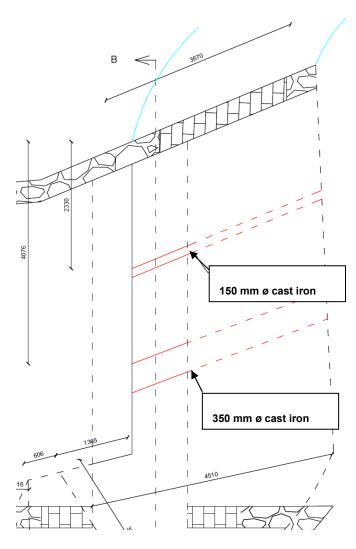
Pipe Crossing Whitechurch Road Bridge (Area 3 and 4)
